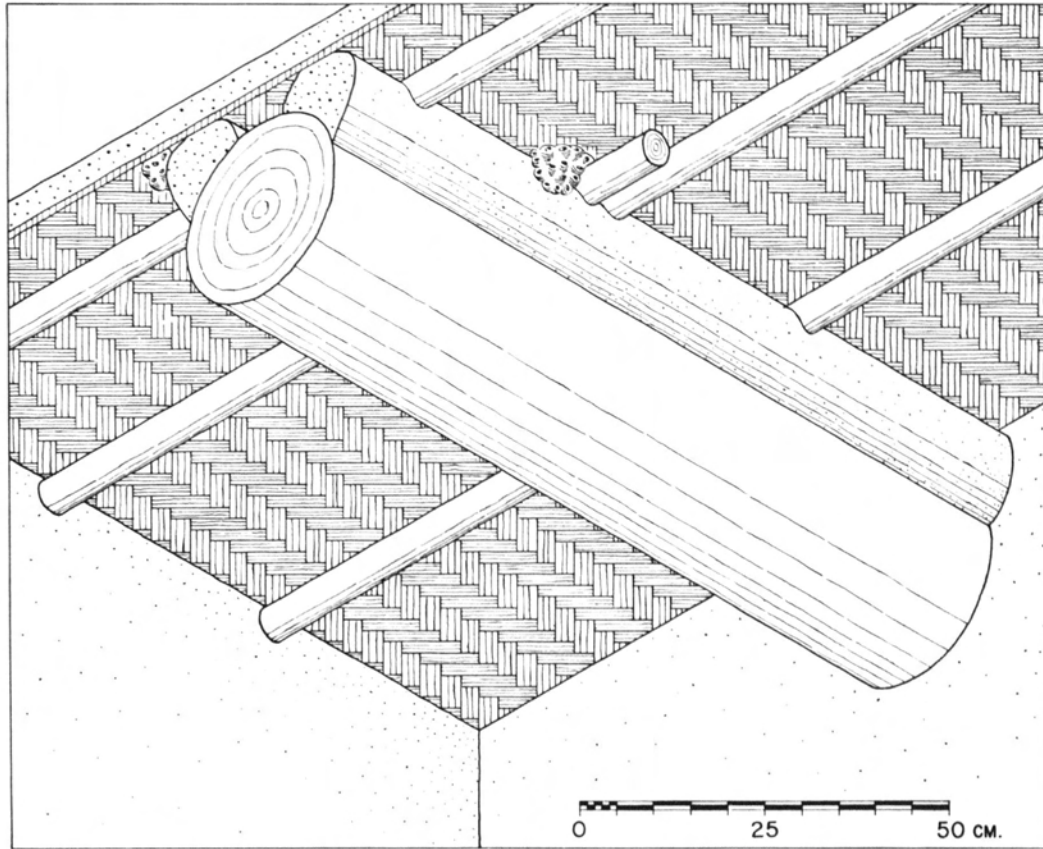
ISOMETRIC DRAWING OF THE RESTORED CEILING OF ROOM L 43:9, SHOWING DETAILS INDICATED BY REMAINS FOUND IN THE ROOM. SCALE, 1:10
